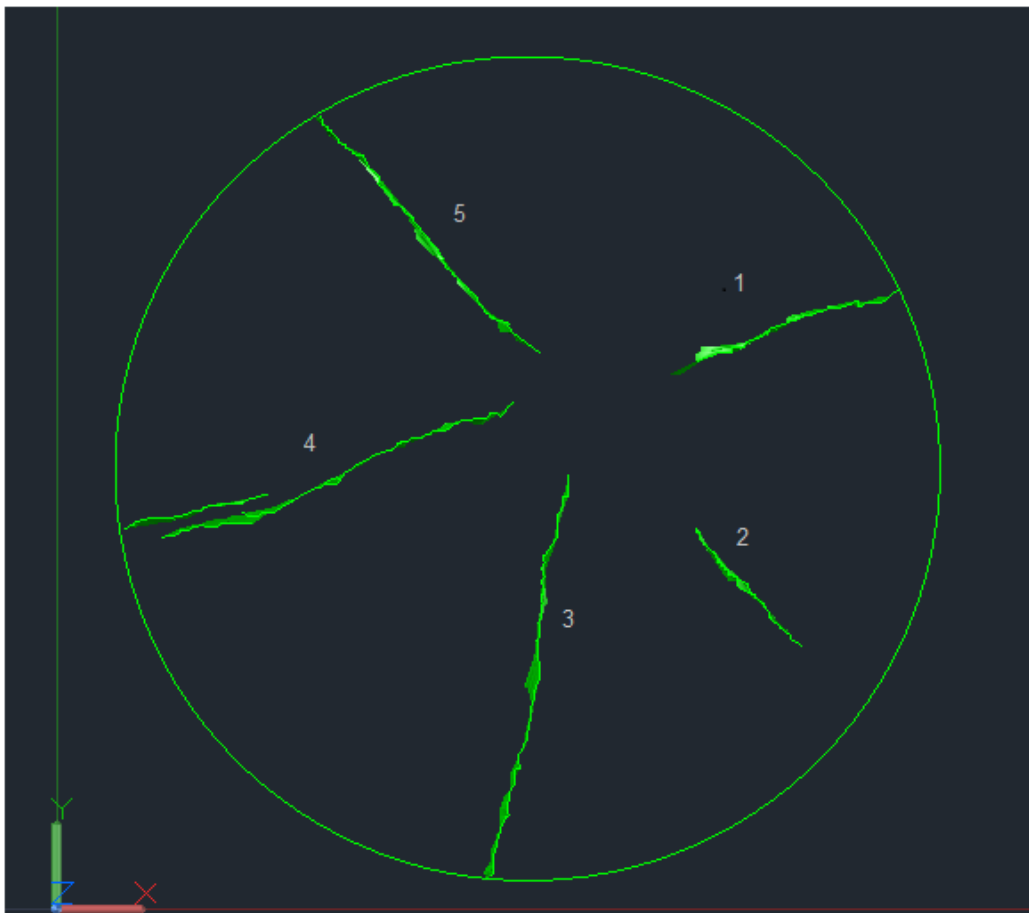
First layer of top view 2 mm below the surface with radial cracks.
